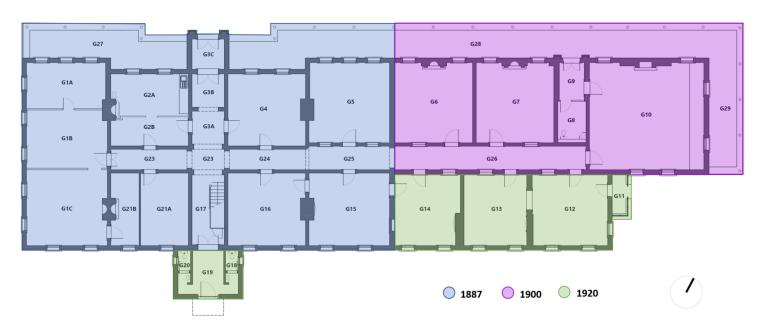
Ground floor plans of the CME building with the three main phases of construction. (Source: Rappoport & Caldis Cook Group, 1997 with Curio additions)
